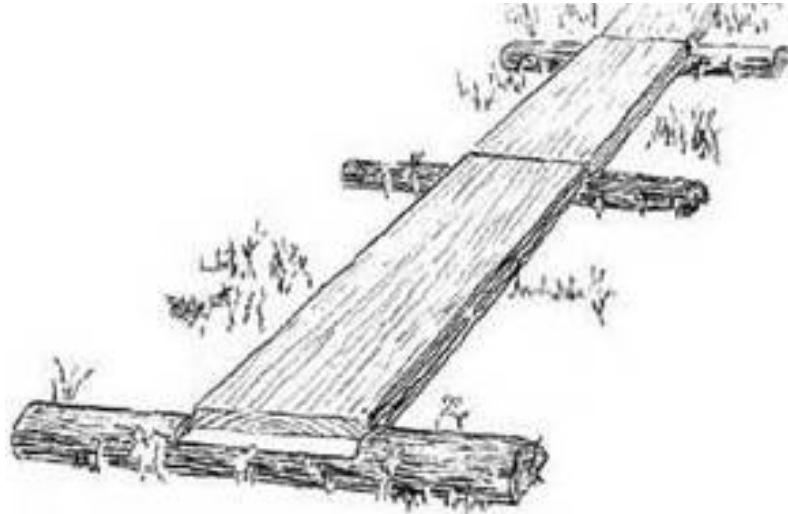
Bog Bridge (USFS *Wetland Trail Design and Construction*)
